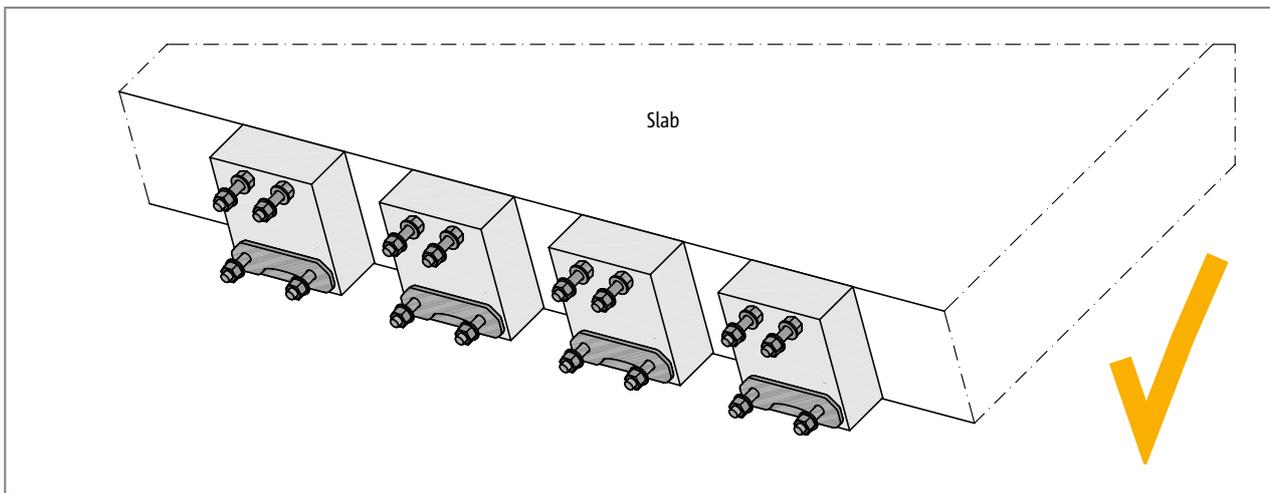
Schöck Isokorb® T type SK: Reliable and correct setting while pouring the concrete ensures the tolerance accuracy is maintained.
